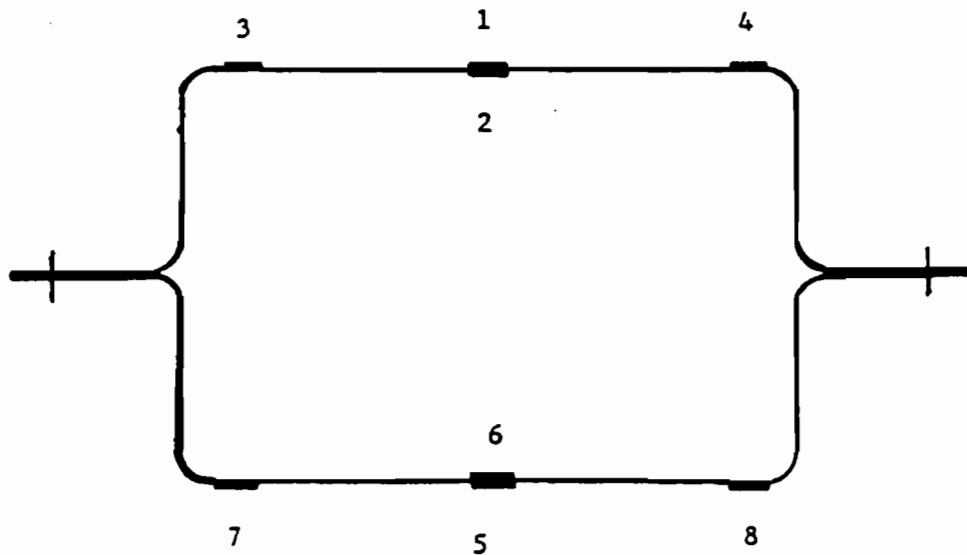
Locations of Strain Gages at Midheight of Box-Shaped Stub Columns
